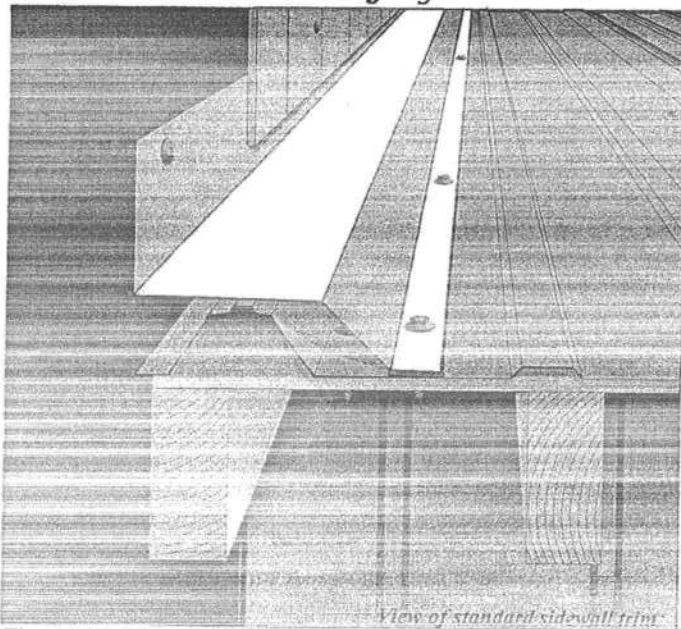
Sidewall flashing is applied when the side of the roof butts up against an adjacent wall. The wall-side of the flashing can either be covered over with siding or sealed with counterflashing. Butyl tape should be applied where the "foot" of the flashing attaches to the roof, and, if used, along the top edge of the counterflashing.
